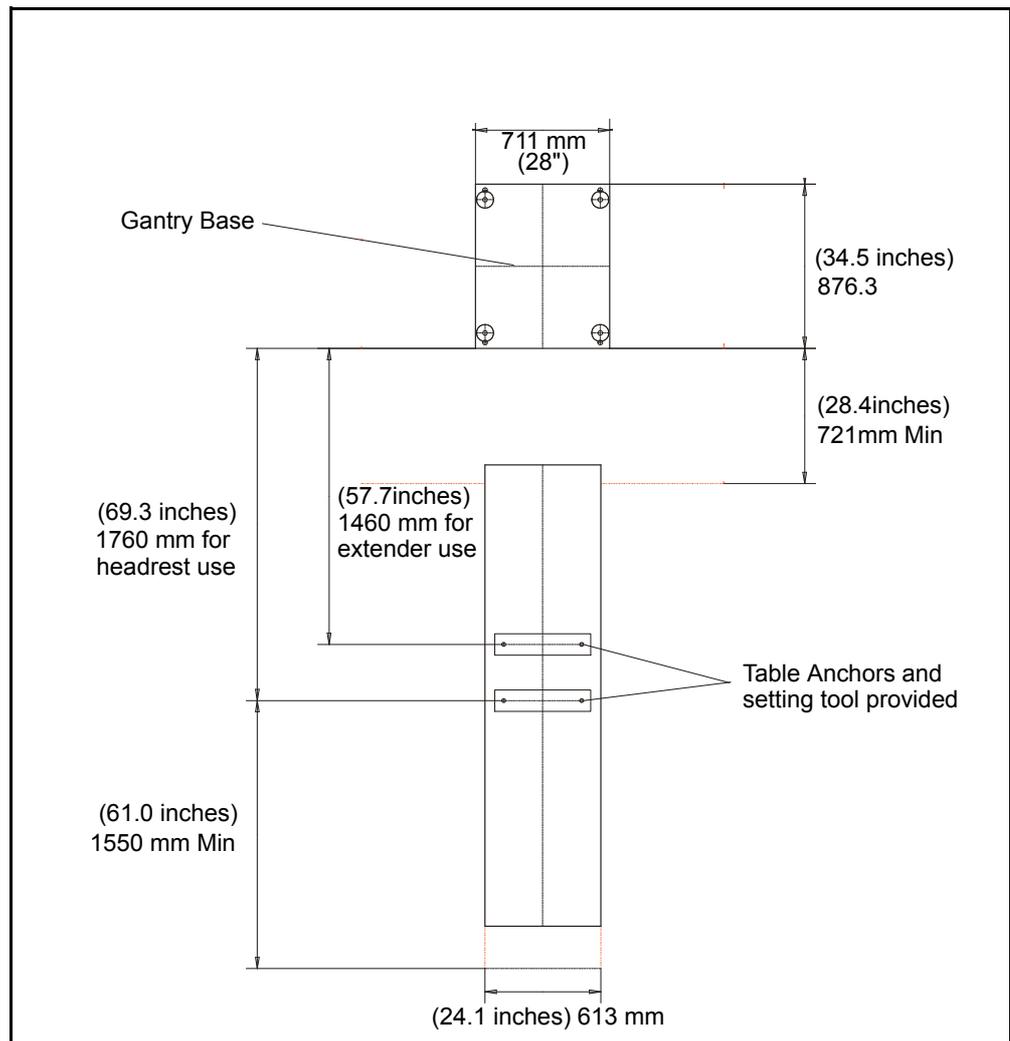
MPS Gantry and Patient Table Floor Plan
